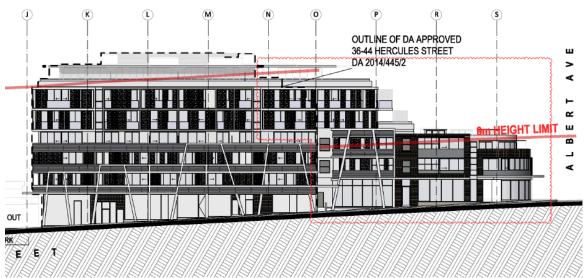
Proposed continuation of Oscar Street South elevation on the corner lot at 17 Albert Avenue showing Height non-compliances
